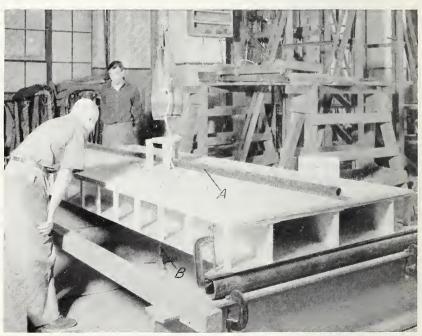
Floor specimen CW-I1 during the impact test.
